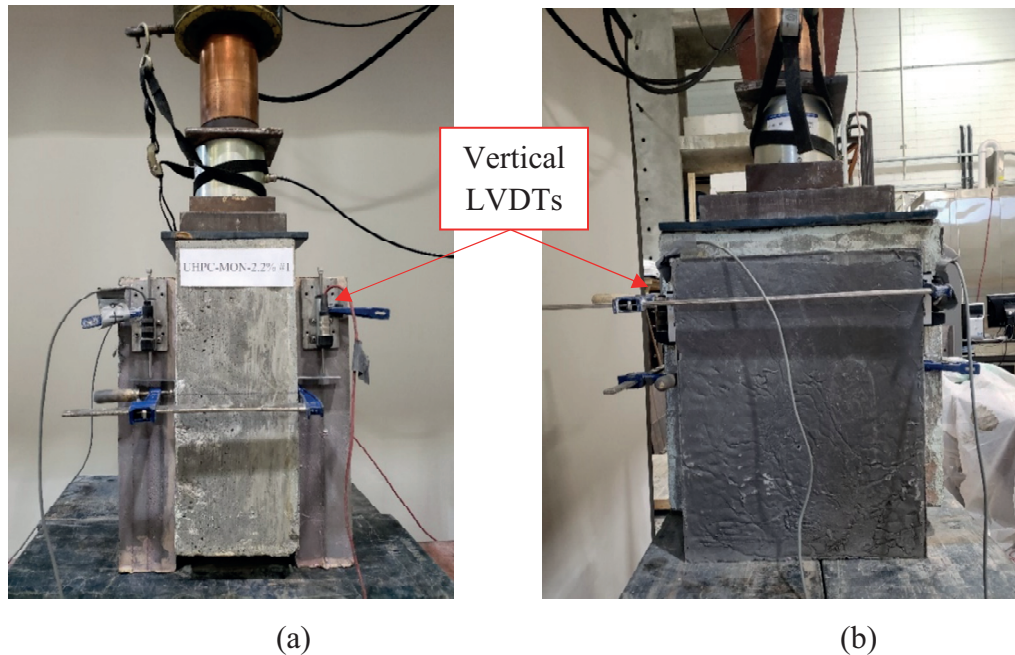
Double Shear Specimen Test Setup; (a) Front View, and (b) Side View.
